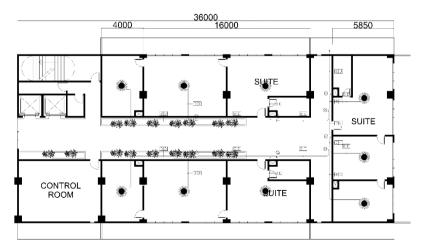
Air Conditioning Layout 7th - 10th Floor Source: (Author, 2022)
